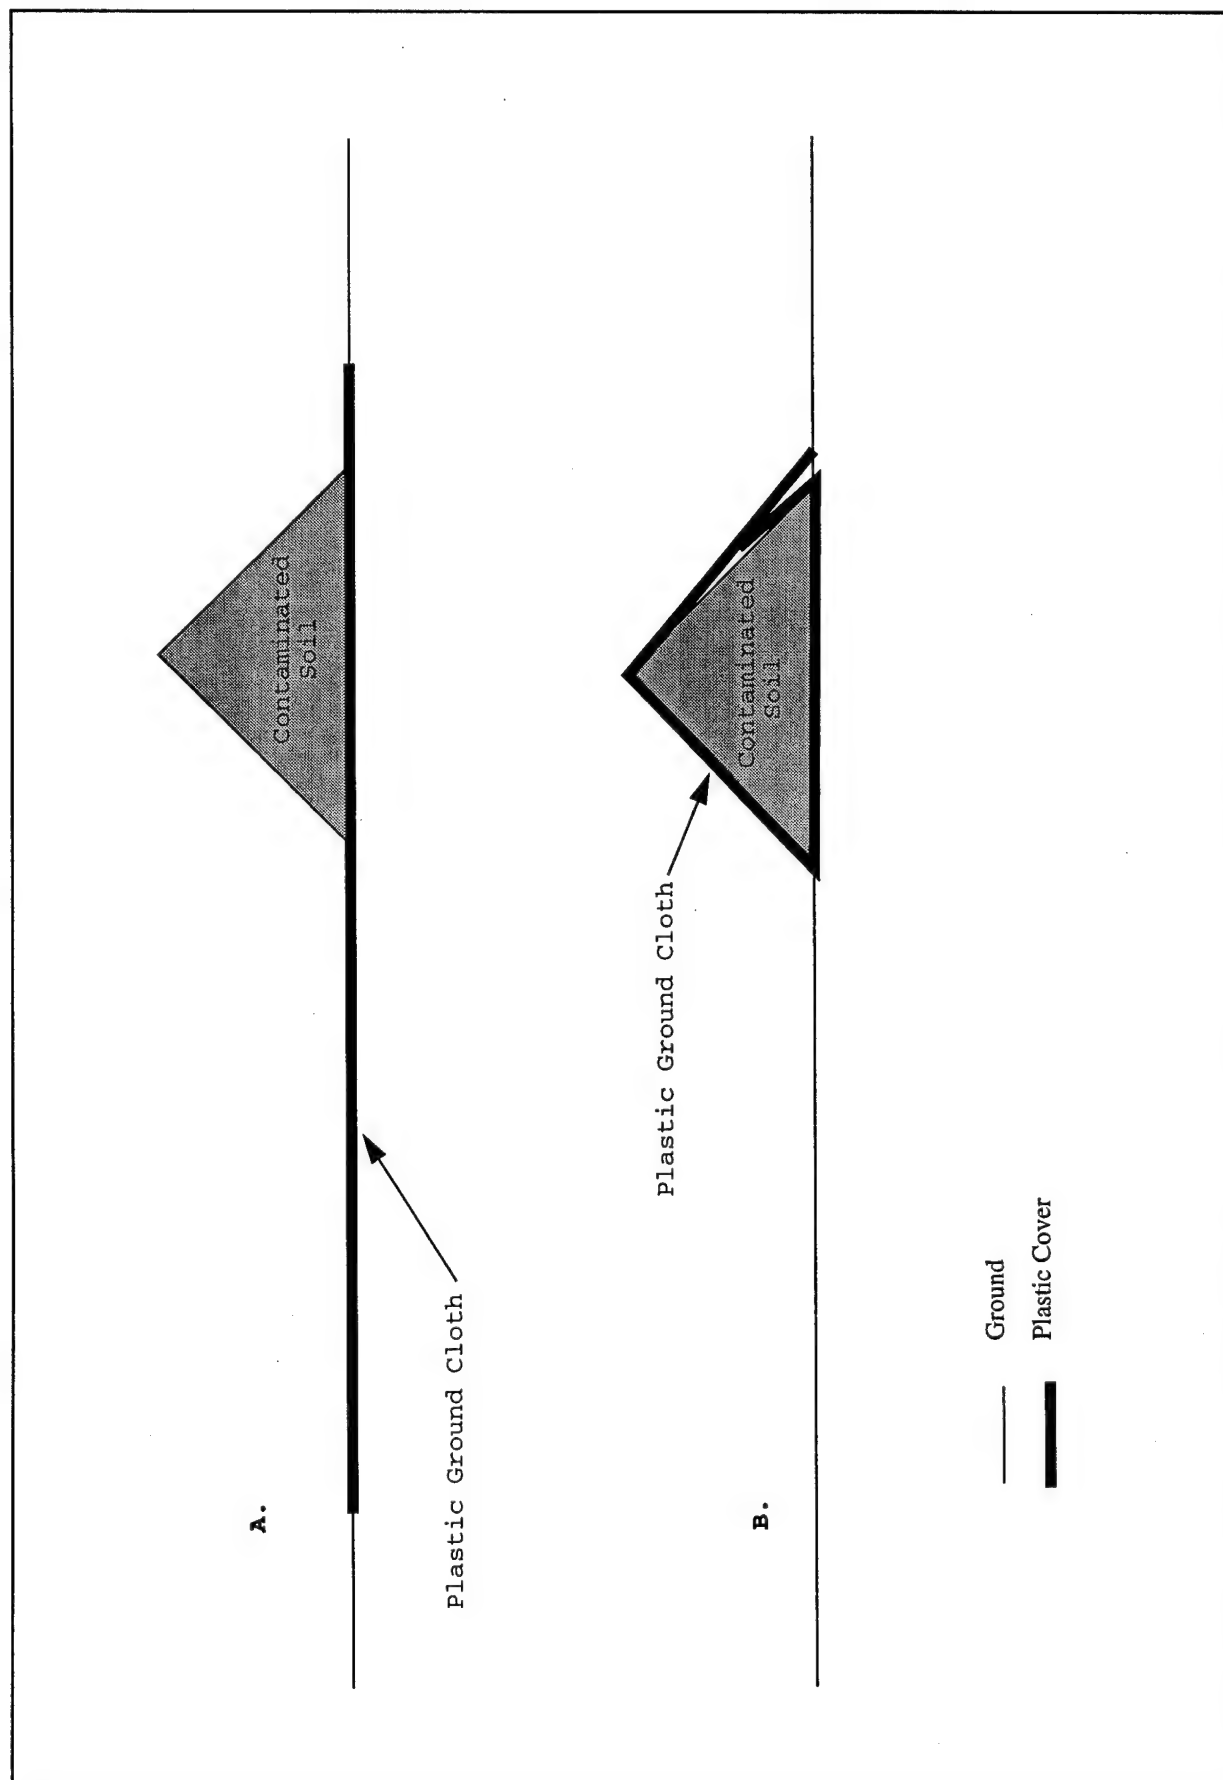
Cross section of windrow envelope construction showing (a) contaminated soil placed on ground cloth about 2 ft from long edge and (b) ground cloth folded around soil to create envelope.
